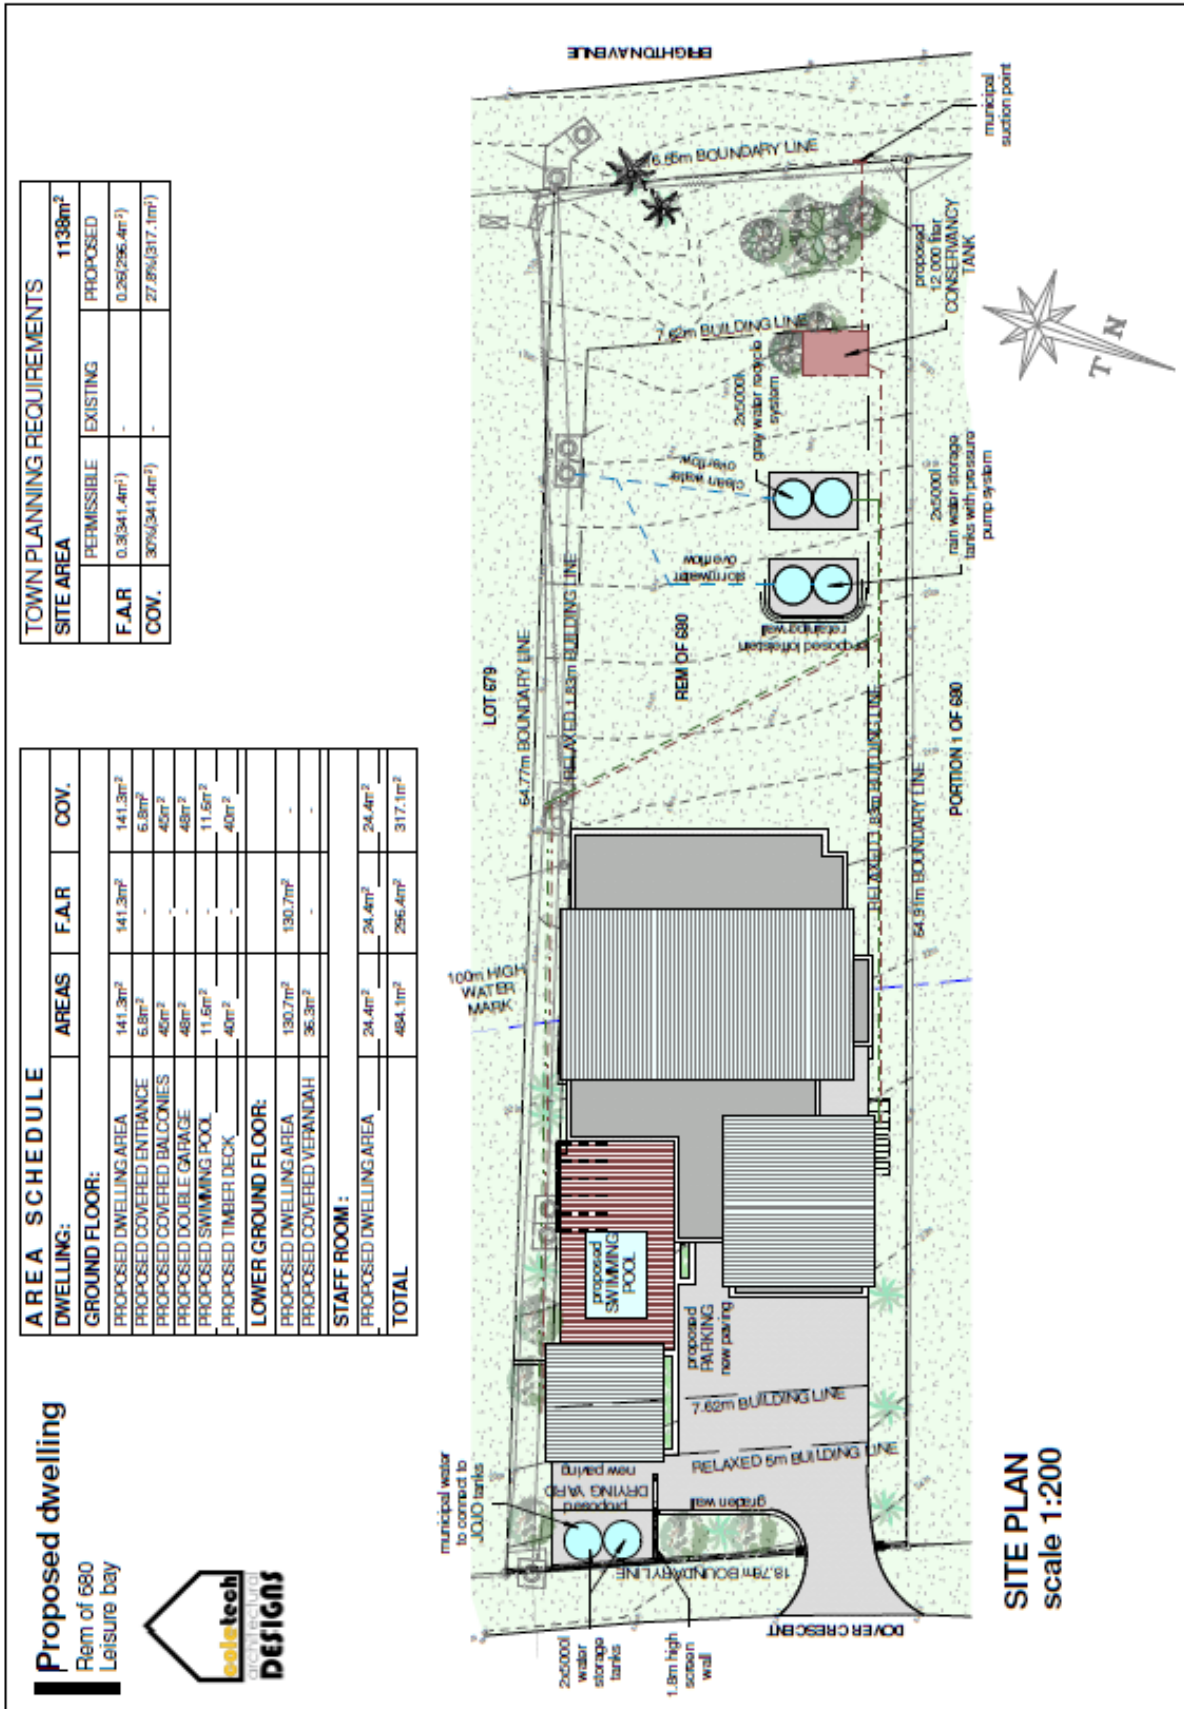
Site Layout Plan (also showing the high water mark (HWM))
